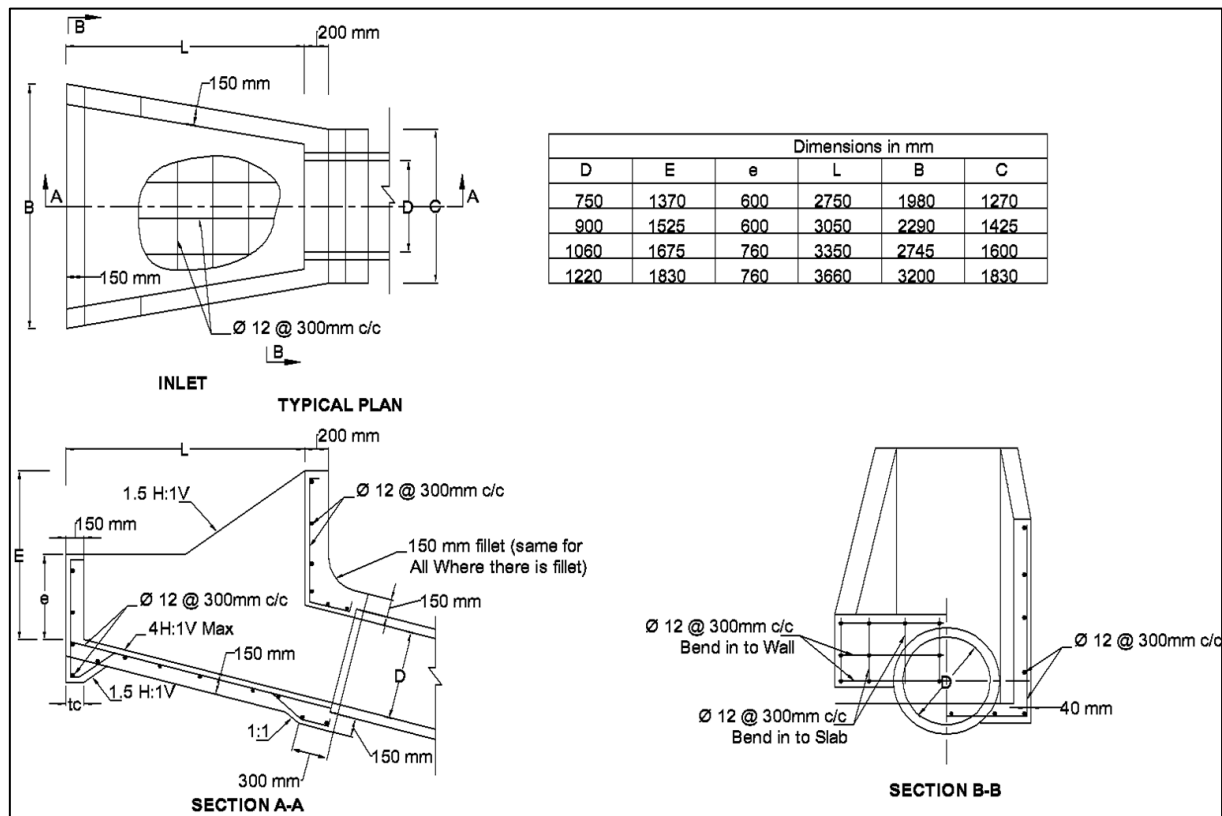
Drawing of Transition Type-IV inlet and outlet
